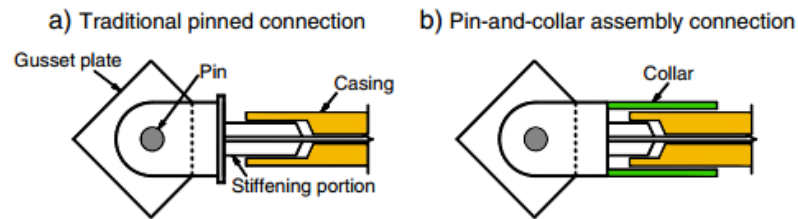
Pinned connection detail (Junxian et al., 2014)
